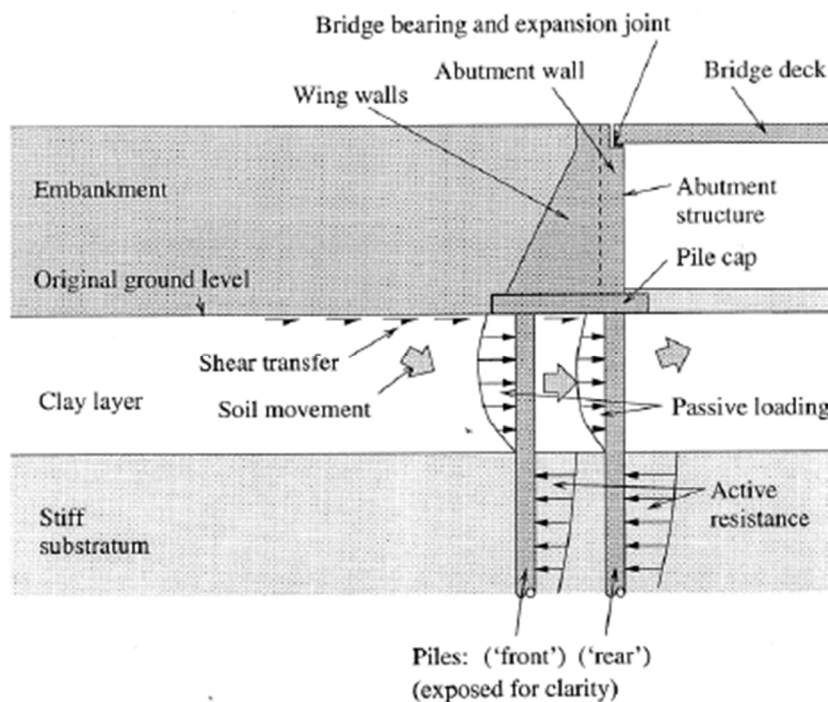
Passive piles in an embankment subjected to horizontal loading from moving soil past the piles (Ellis, E.A. & Springman, S.M., 2001)
